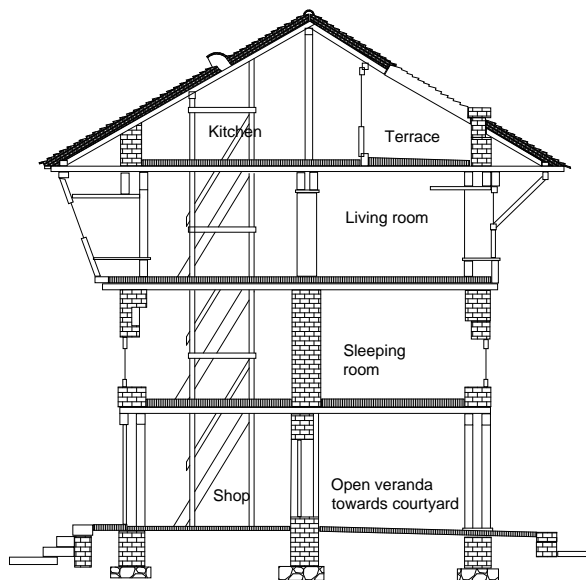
Section of Newar house with vertical space arrangement (after [21])
